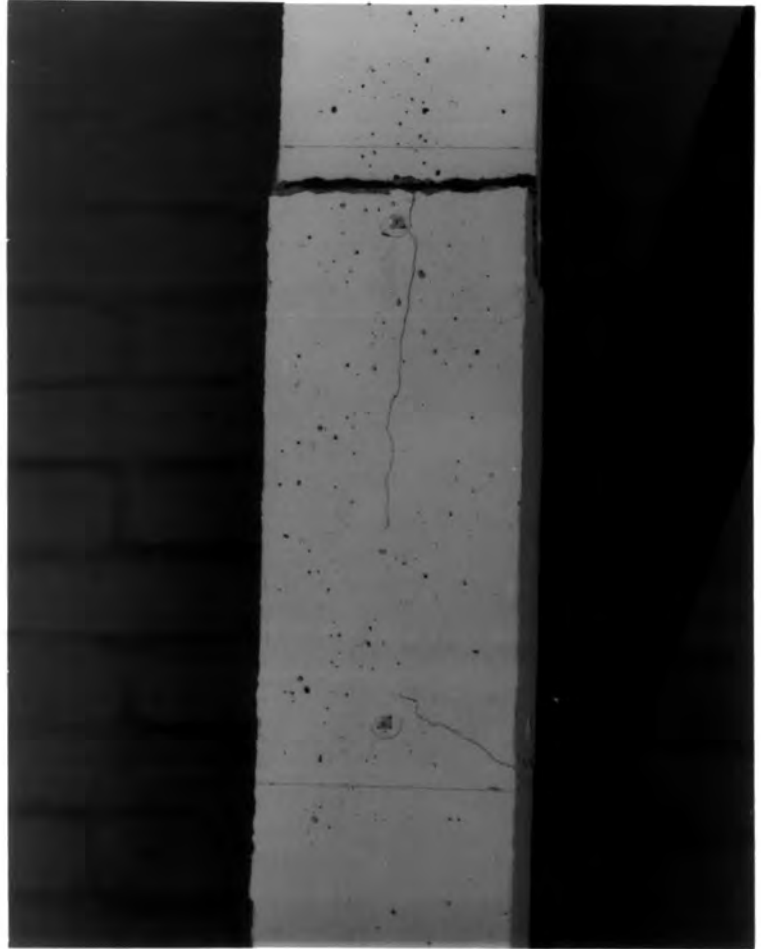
Failed specimens Specimen 250T12/20(B)
